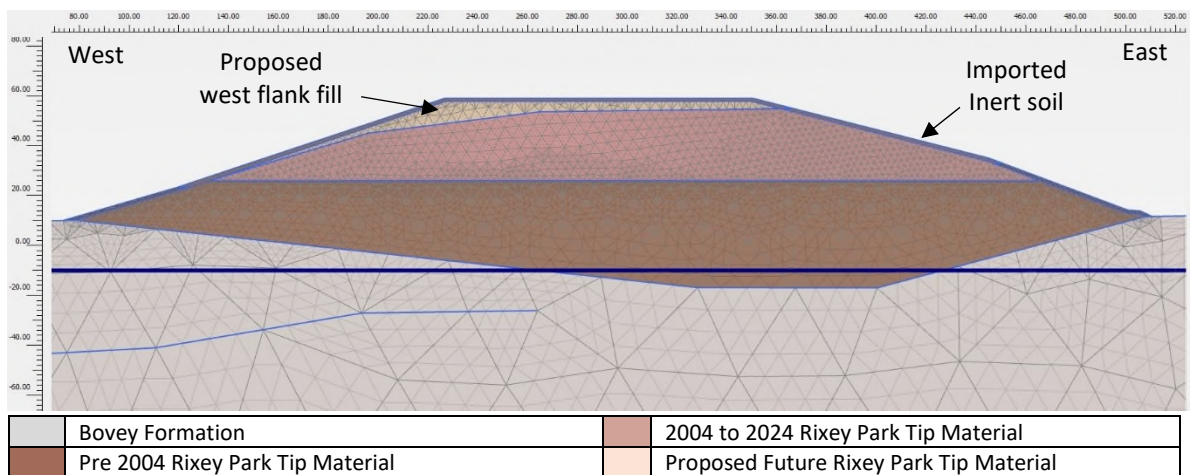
Model 2 cross section, west to east, after imported inert soils placement Cross section location on Figure SRA14
